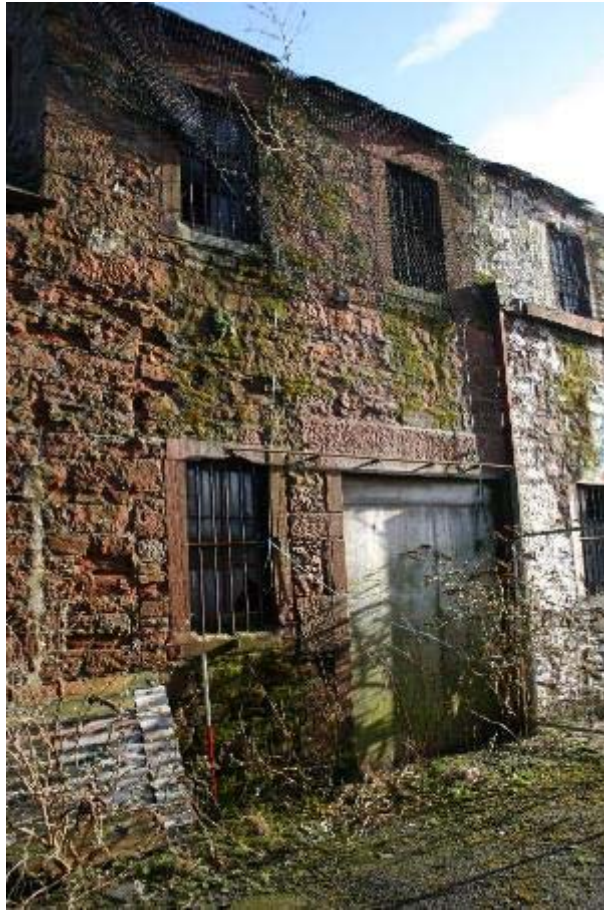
West facing elevation, unpainted section of the possibly industrial building of No 25
